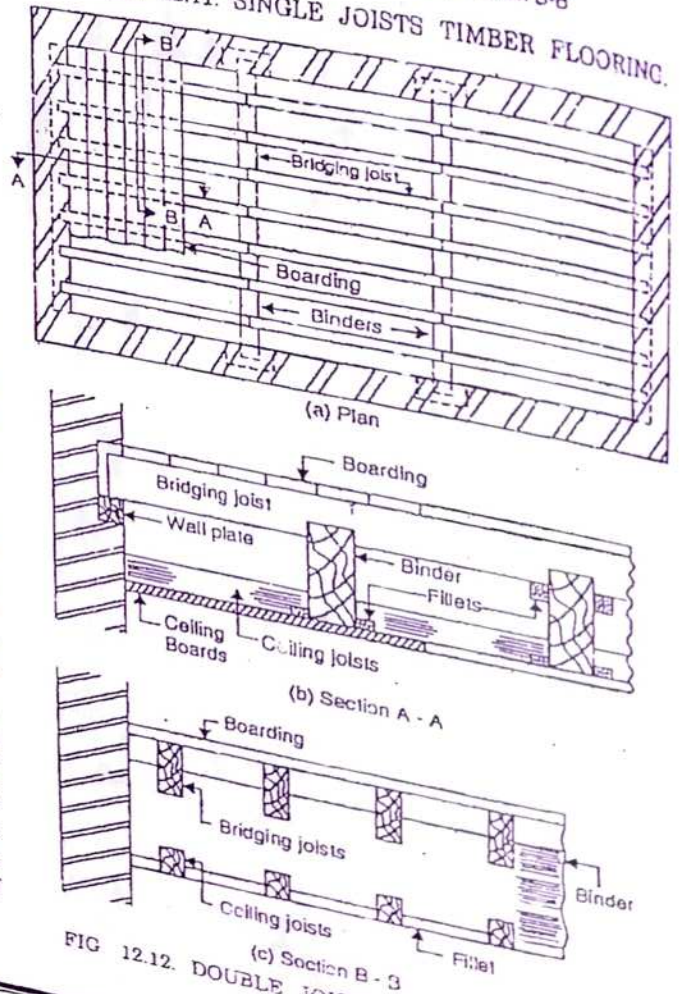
DOUBLE JOISTS TIMBER FLOORING.
